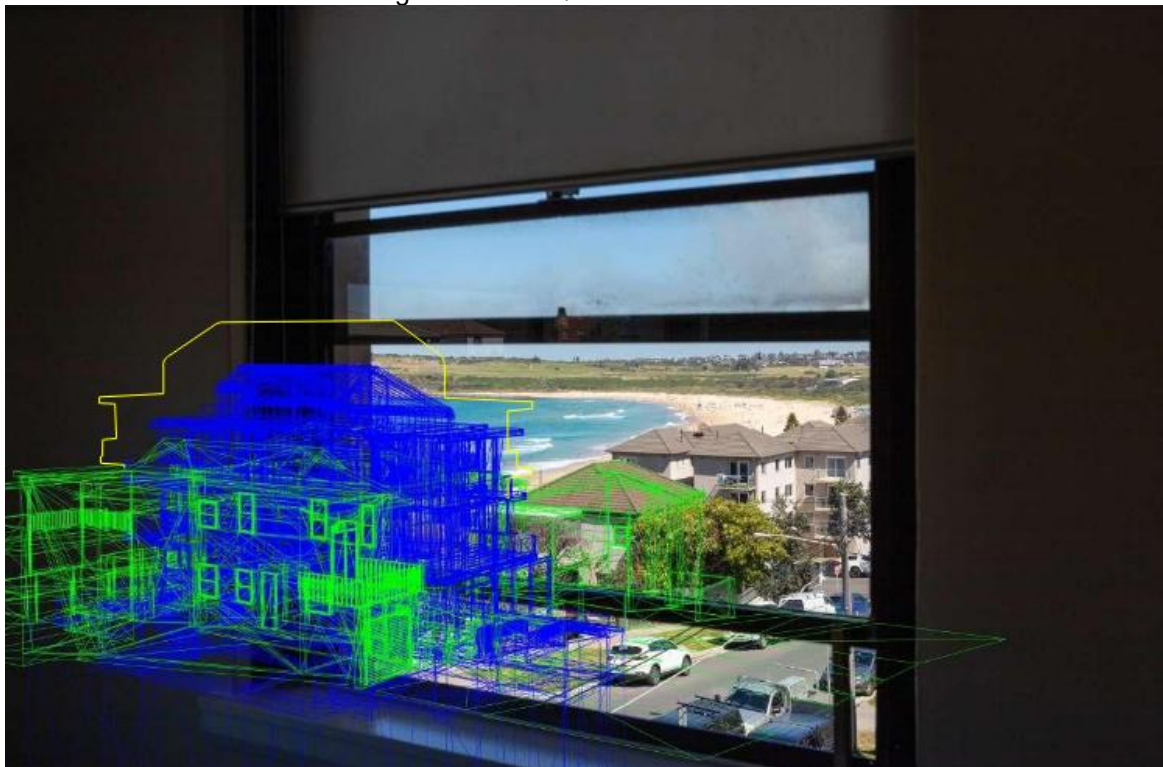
Unit 1: sideways, southerly view from window further back, standing. Minor widening impact of headland, water and views retaining views of surf/beach.
